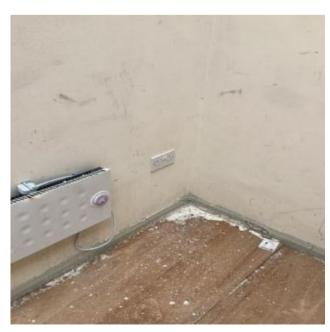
Photo 14 -Yew Tree Cottage, electric heater water damaged
